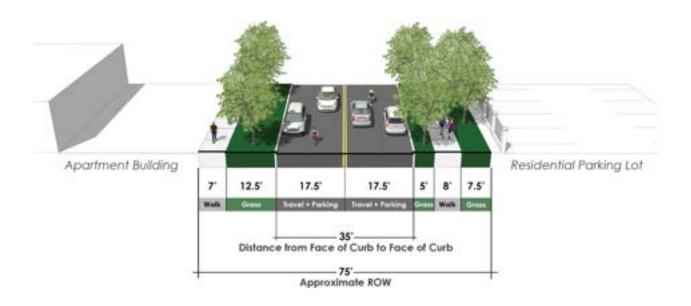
Jasmine Terrace (Extension) – Existing Cross-Section (Looking East)
